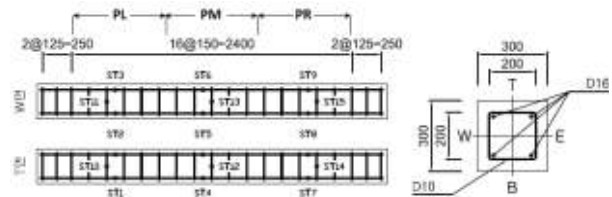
Cross Section and Reinforcement Arrangement of Specimens
